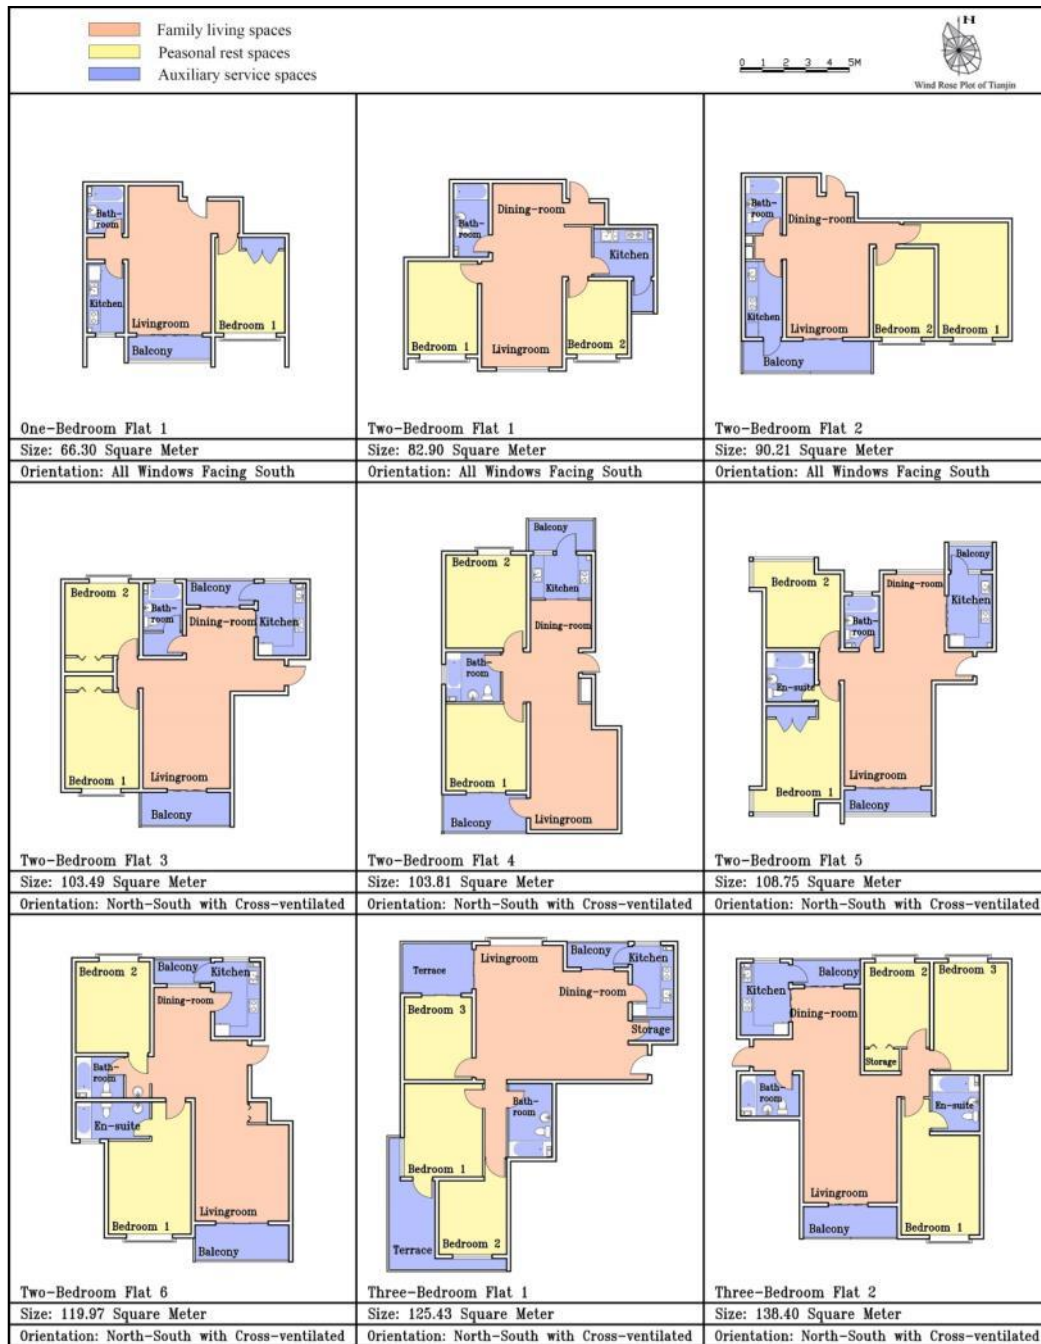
Typical Plans of Dwelling Units of Case 2
